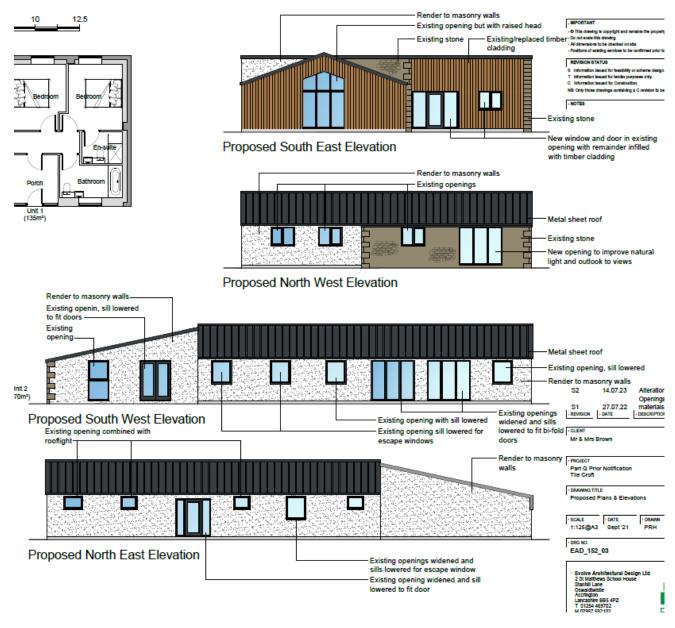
An extract from the Proposed Plan and Elevations (Dwg No. EAD 152 03 Rev S2)
